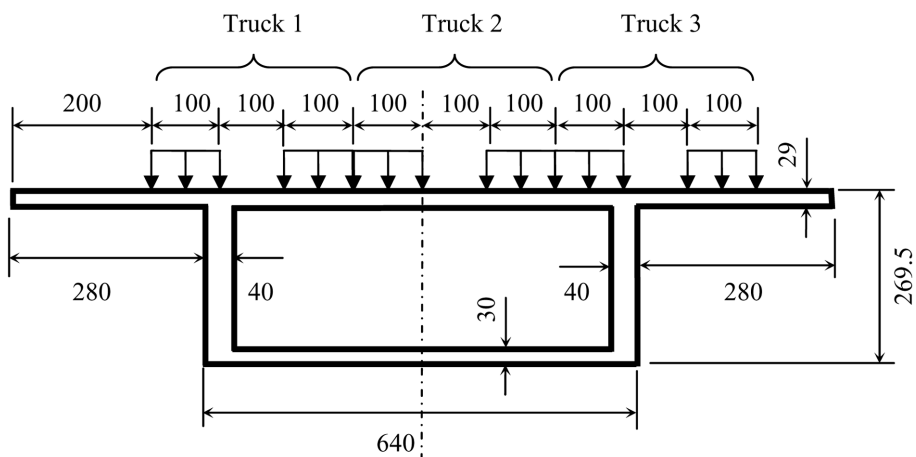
The cross-section of the box beam and the distribution of truck load (unit is in cm)
